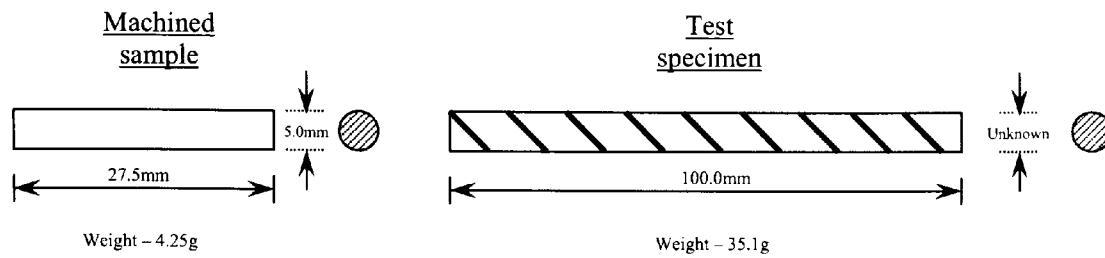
Steel reinforcement specimens for cross-sectional determination
